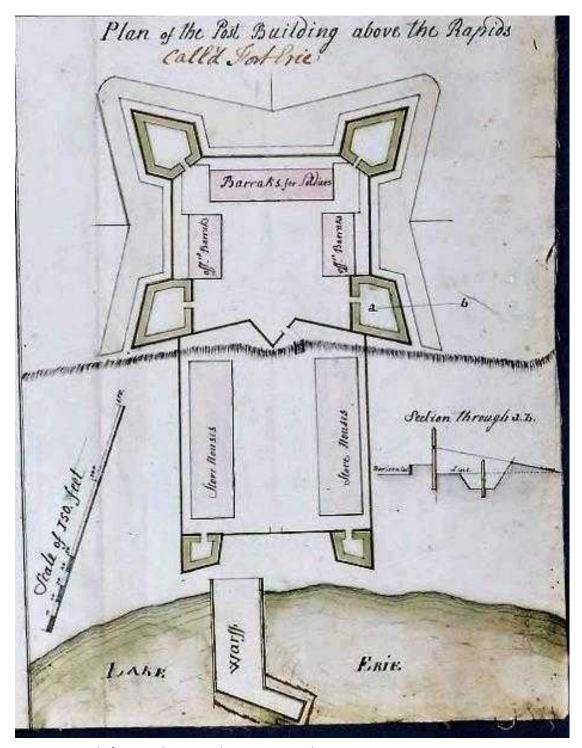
Detail of Ratzer plan, 1764 showing proposed Fort Erie.
